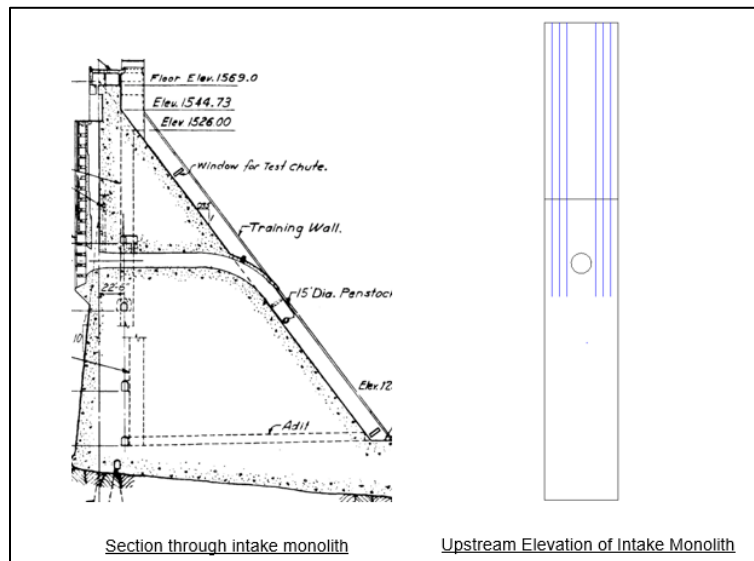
Section and elevation demonstrating need for PT anchors to avoid penstock conduit and galleries
